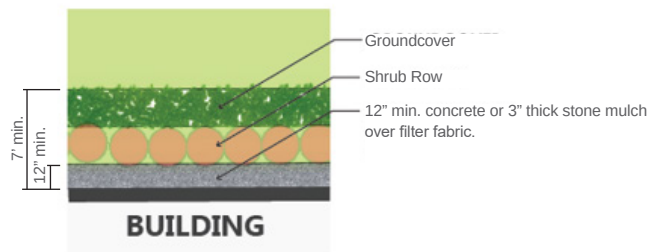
Landscaping Adjacent to Commercial/Mixed Use Building Types (Above)
